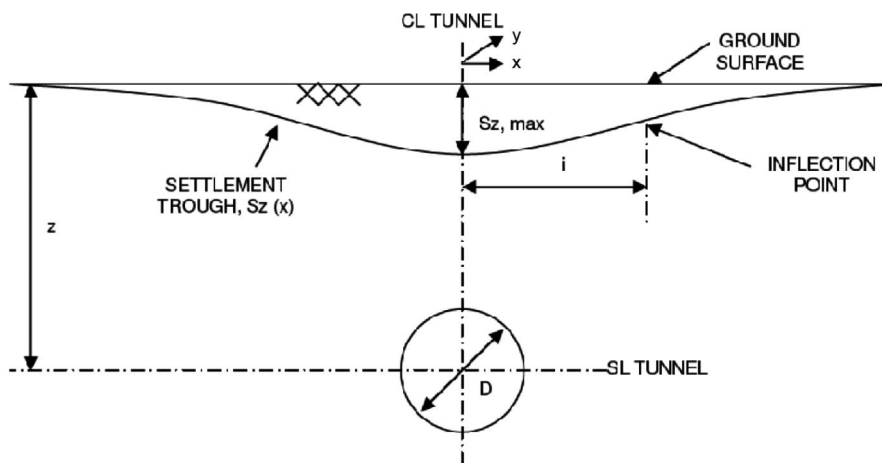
Gaussian Settlement Trough from Tunnelling
